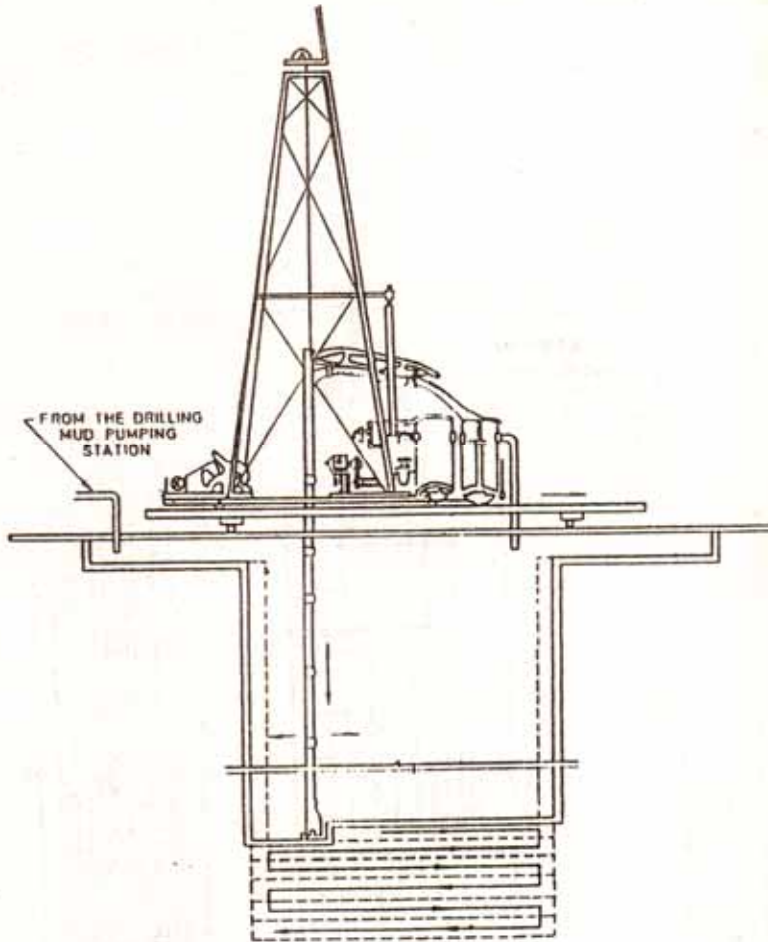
Fig A TRENCH EXCAVATION BY REVERSE CIRCULATION METHOD
